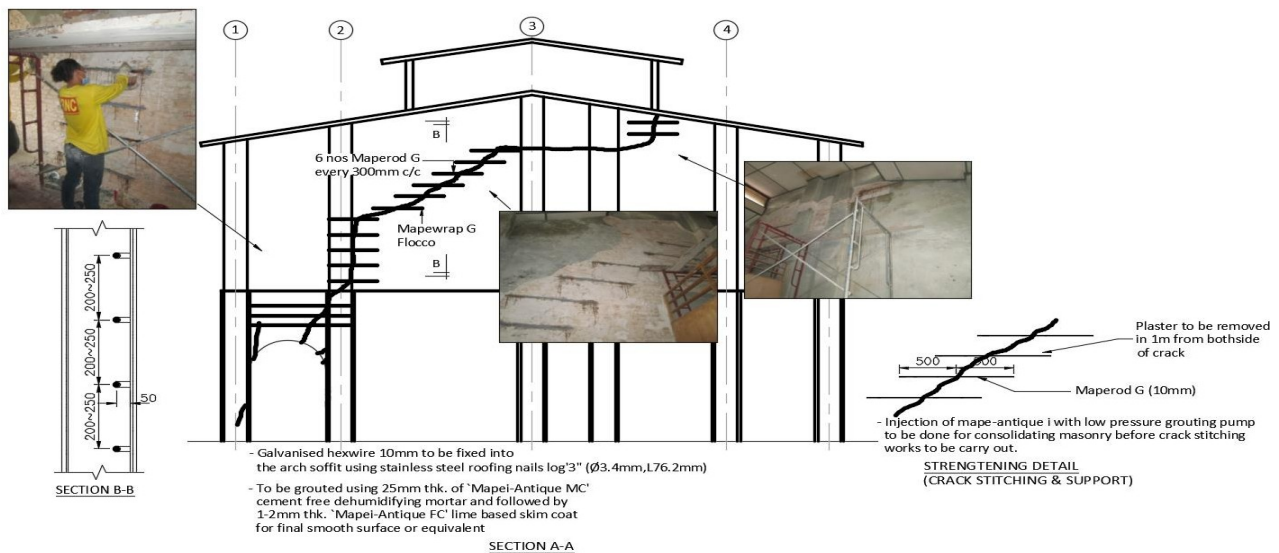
Significant Cracking of the Arch and Party Wall and the proposed approach to crack repair.
